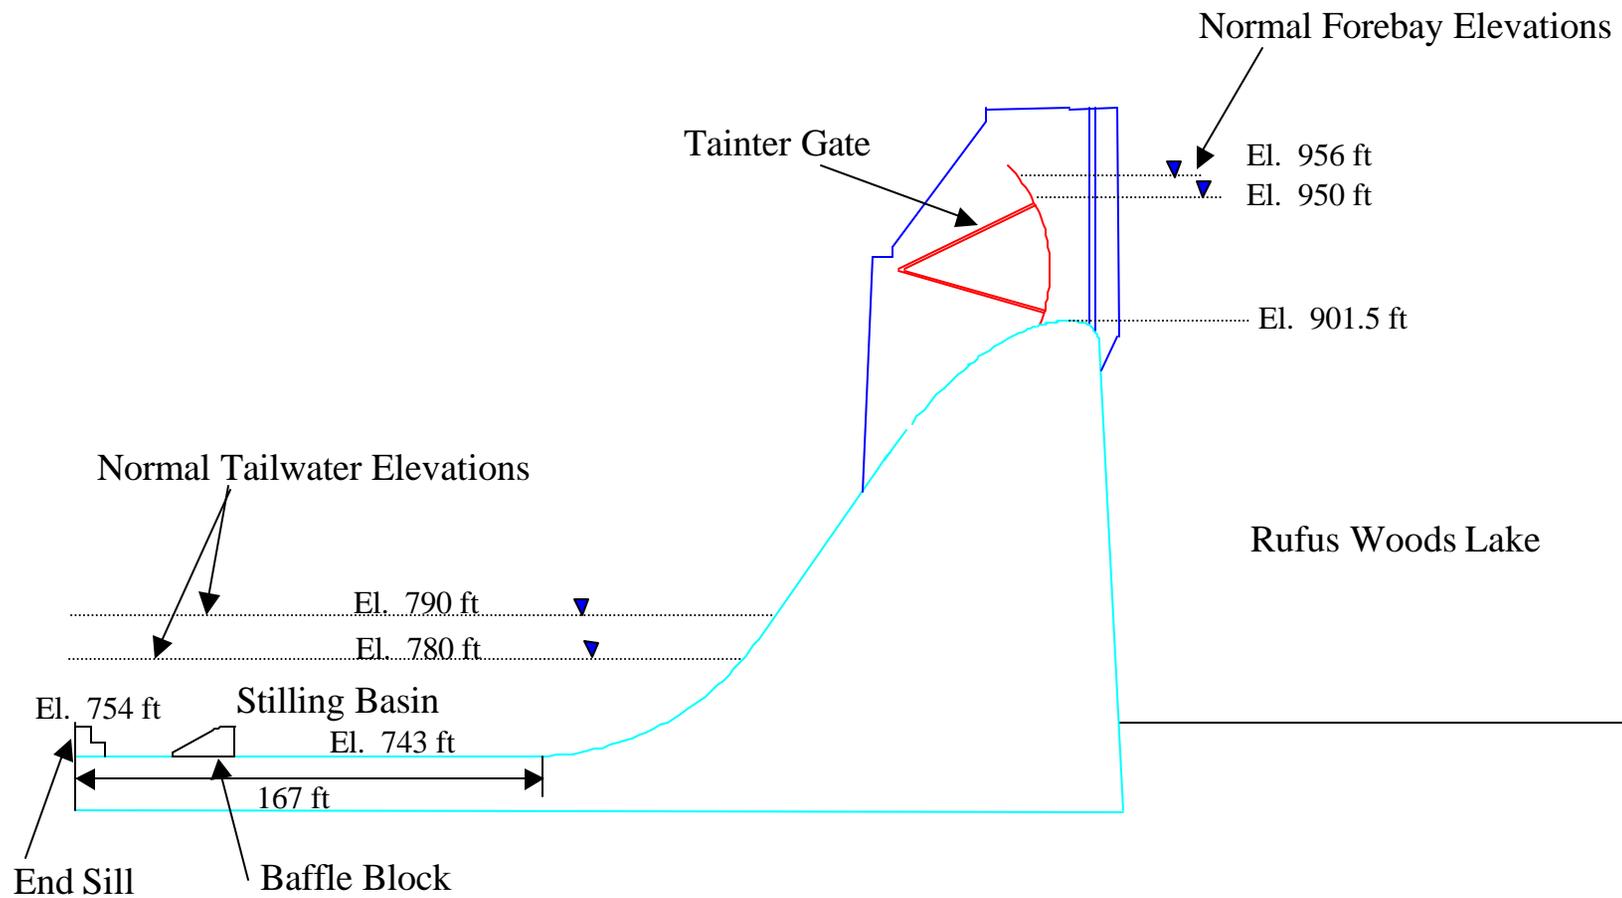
Profile View of Chief Joseph Spillway with Typical Water Surface Elevations.
